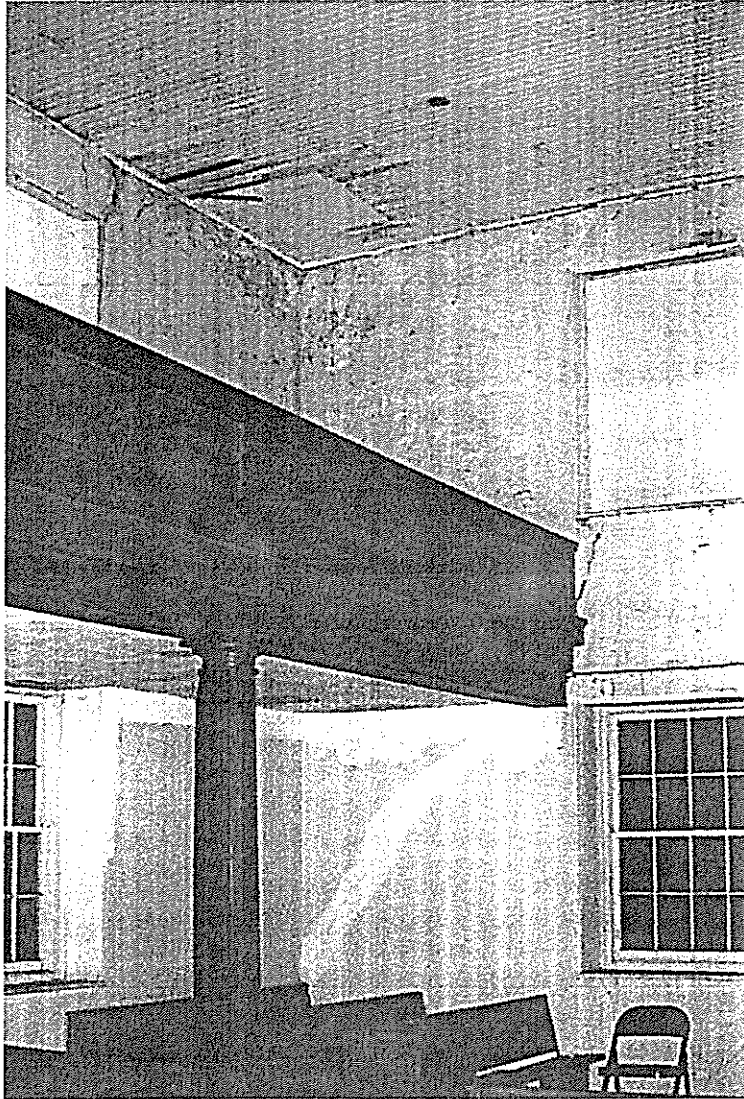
Southeast Corner Finishes. Ceiling boards are failing due to moisture and loading from attic debris. Wall finishes at the west ends of the hall show water damage and cracking due to the masonry problems discussed earlier. (Image taken: 11/97)
